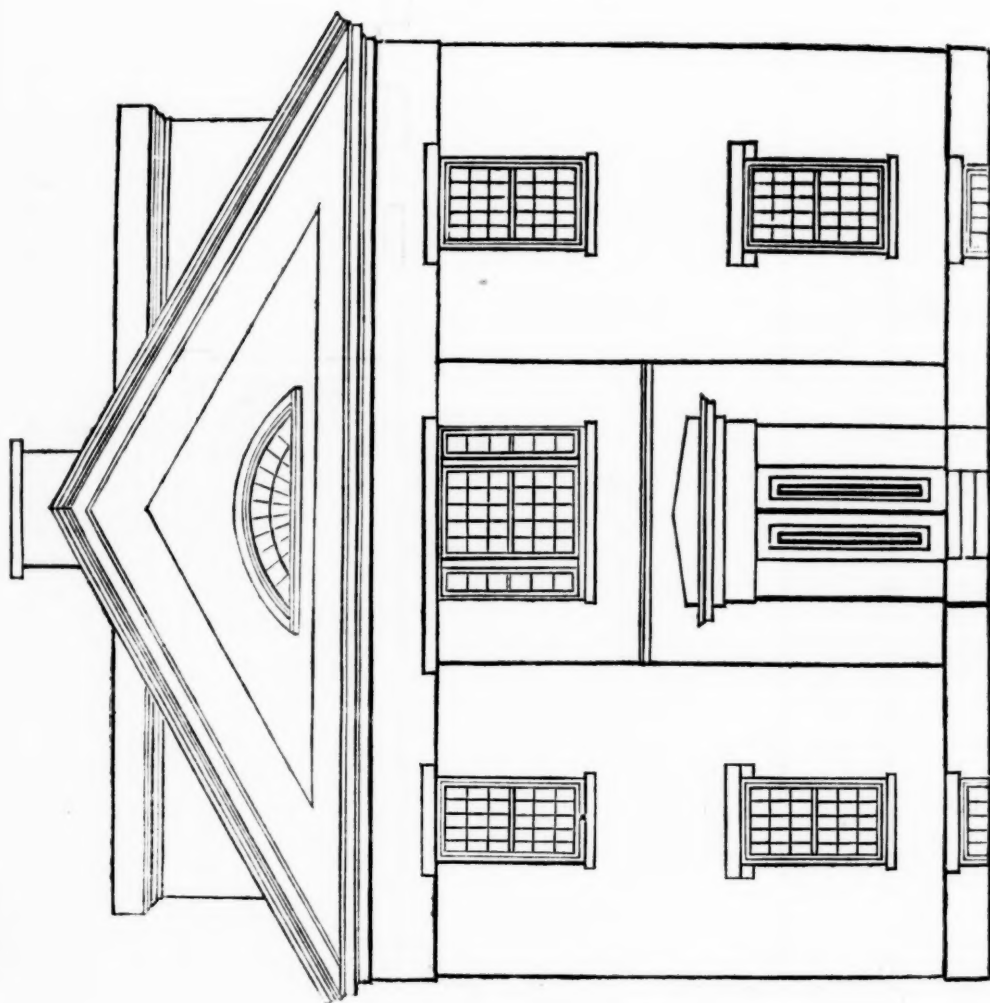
LOWELL HIGH SCHOOLHOUSE. *End Elevation.
